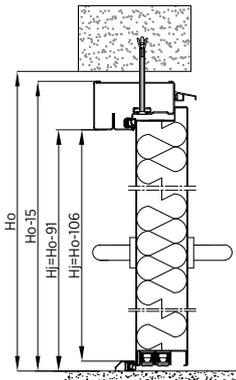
Installation of the single-leaf door to a masonry wall - internal frame with a thermal break - vertical cross-section
